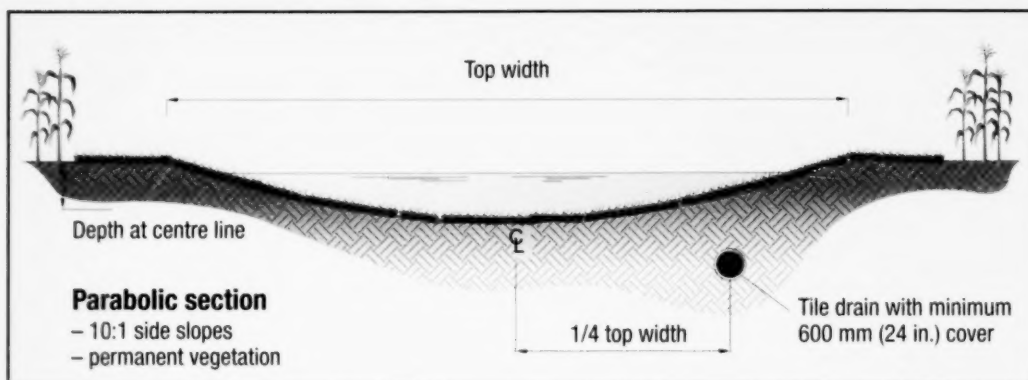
Typical Cross-section of Parabolic Grassed Waterway
